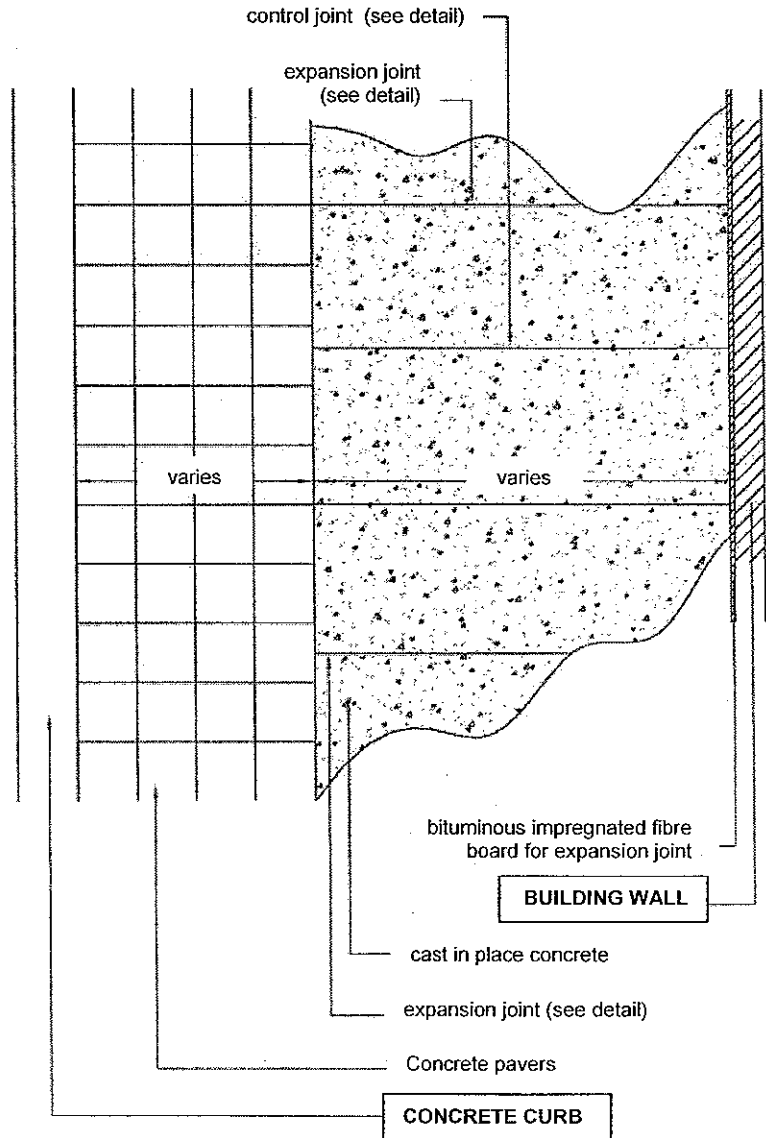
SIDEWALK CORRIDOR CURB SIDE TO BUILDING WALL
